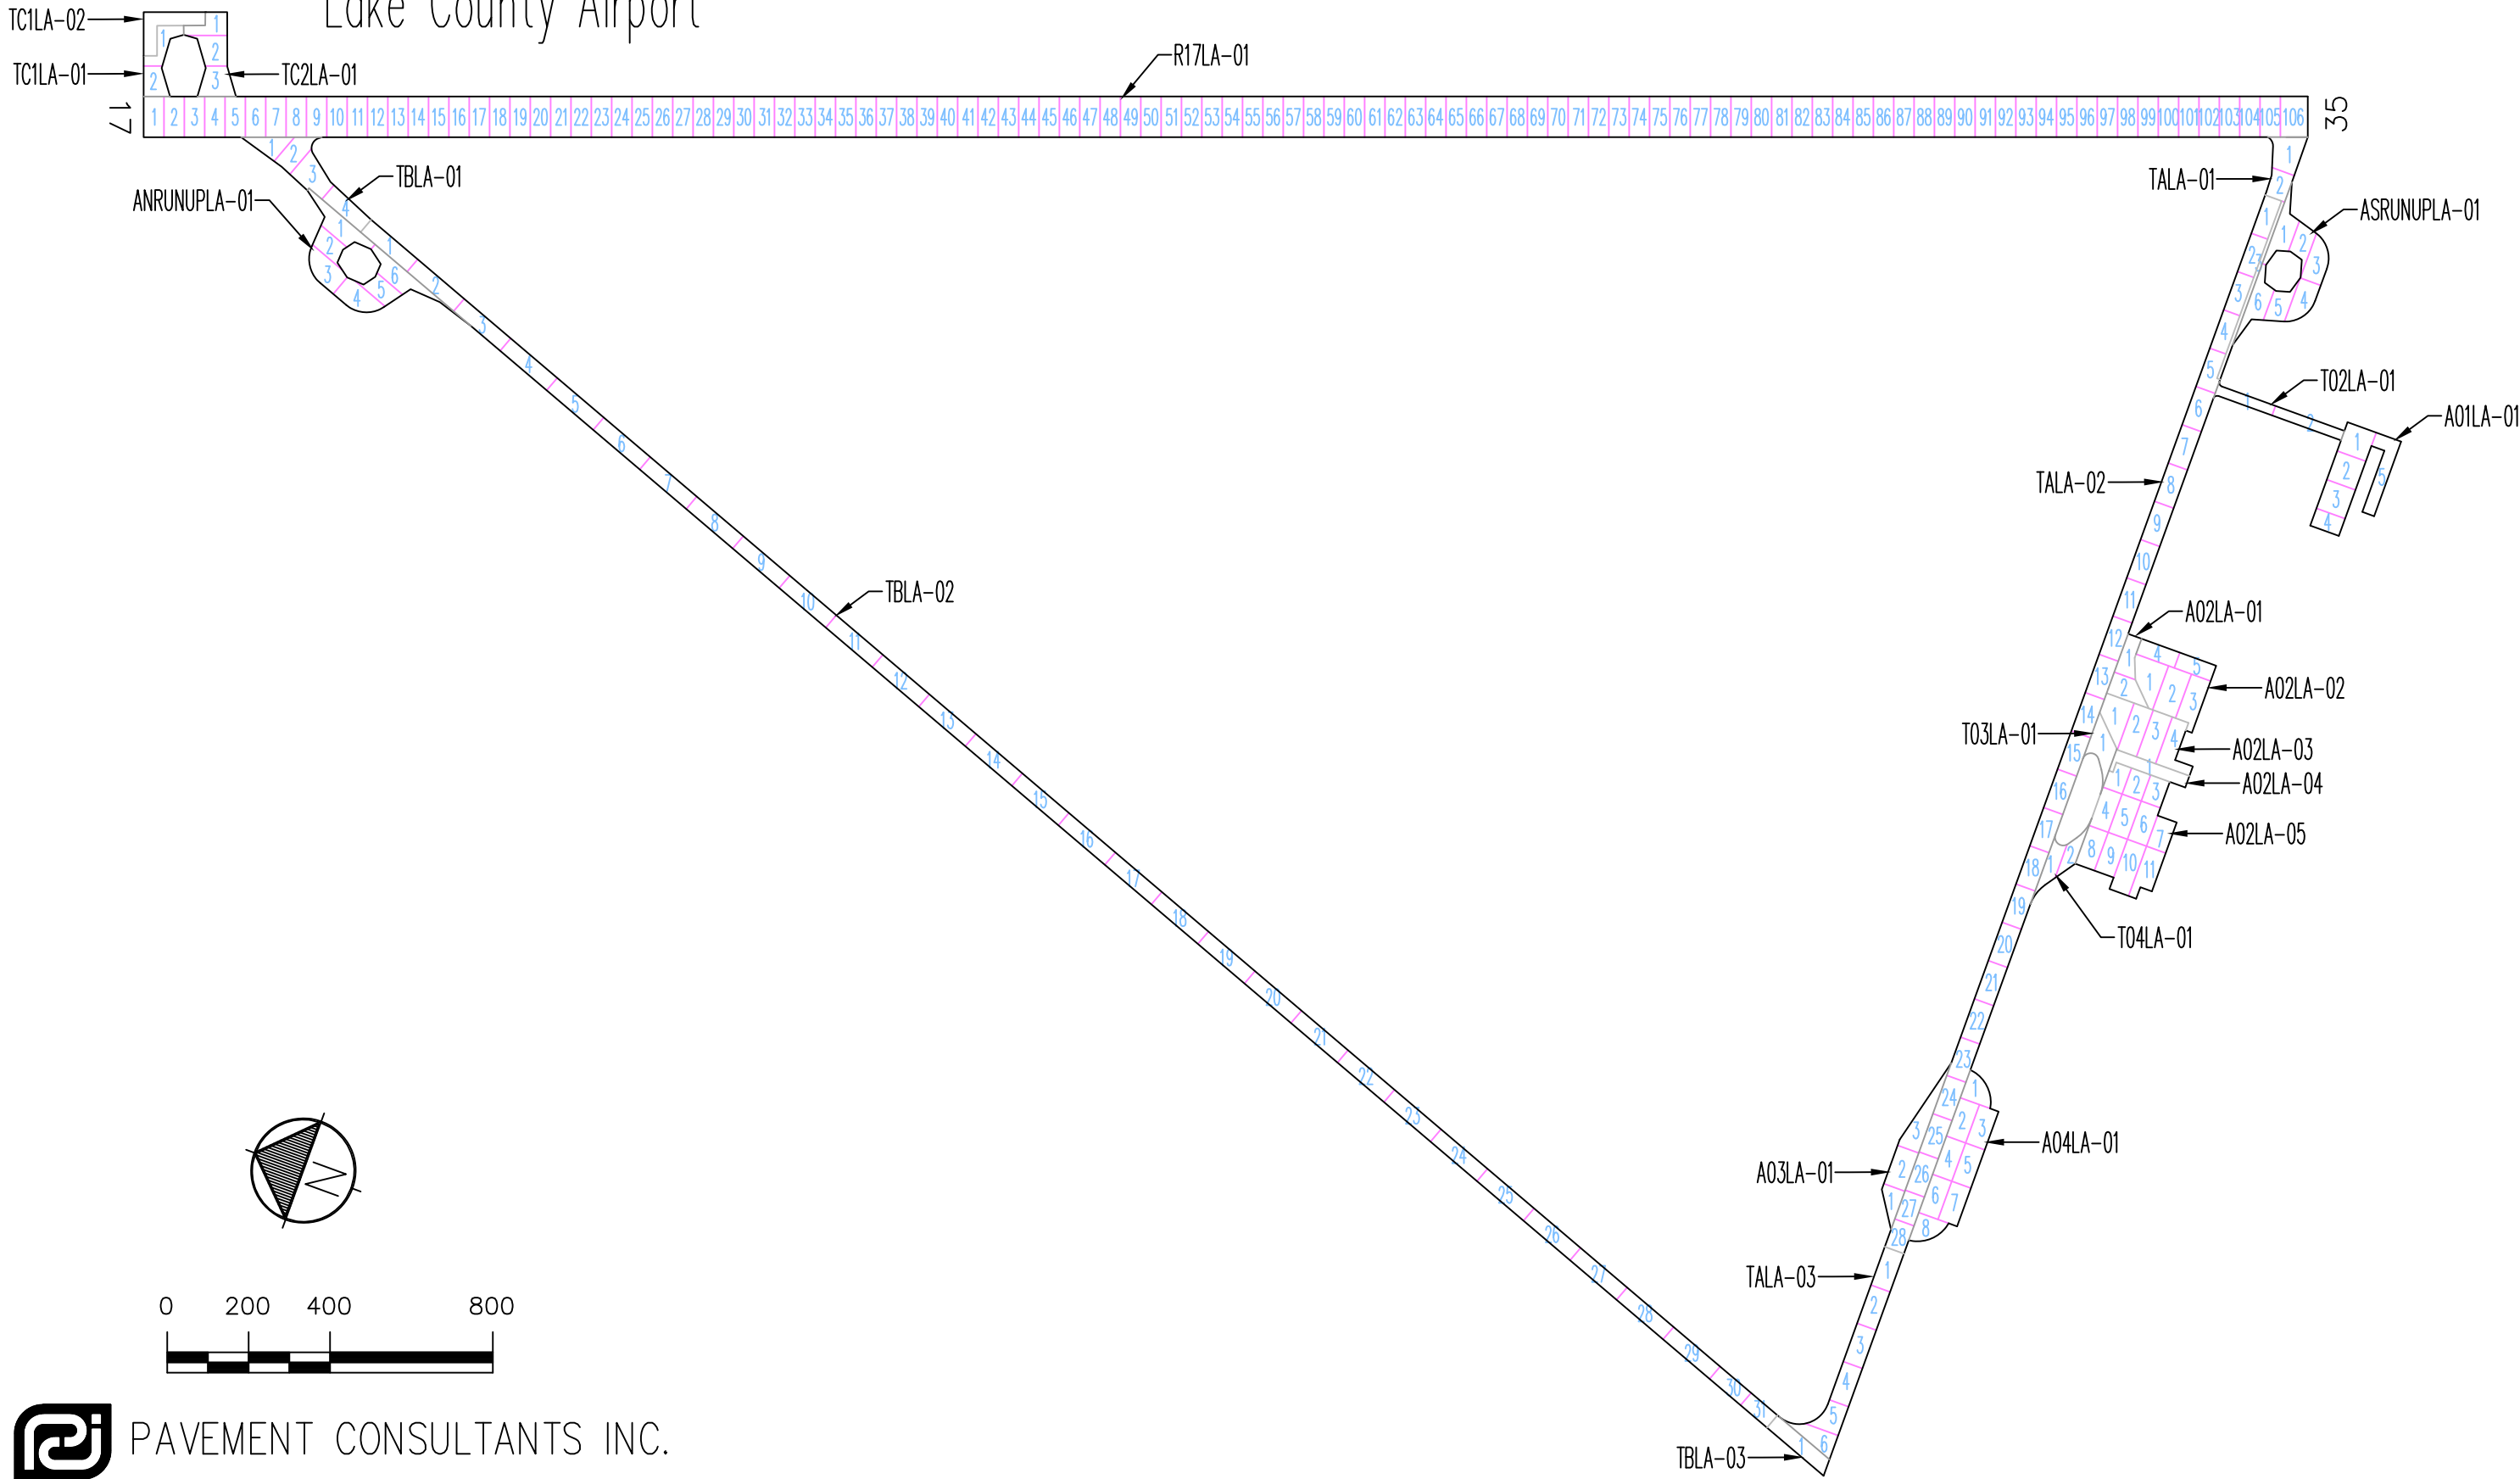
Pavement Branch, Section and Sample Unit Layout.
